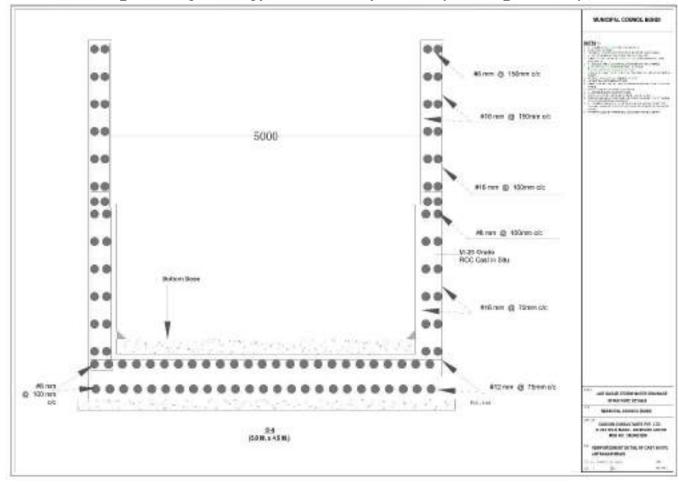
Layout of Typical Detail of Open Drain (U Through Section)
